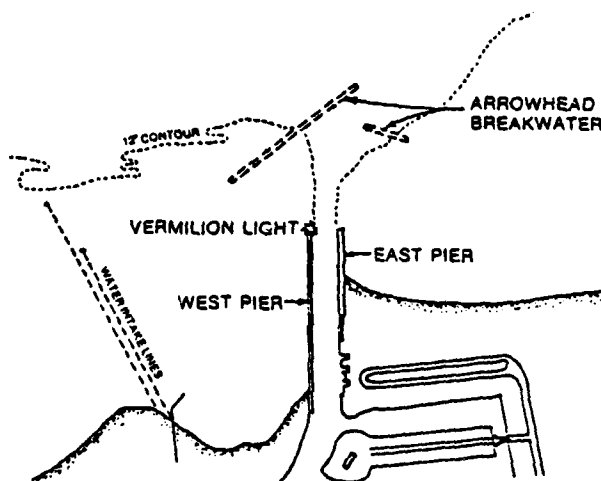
• BREAKWATER AS PROPOSED IN SURVEY REPORT OF 1956
